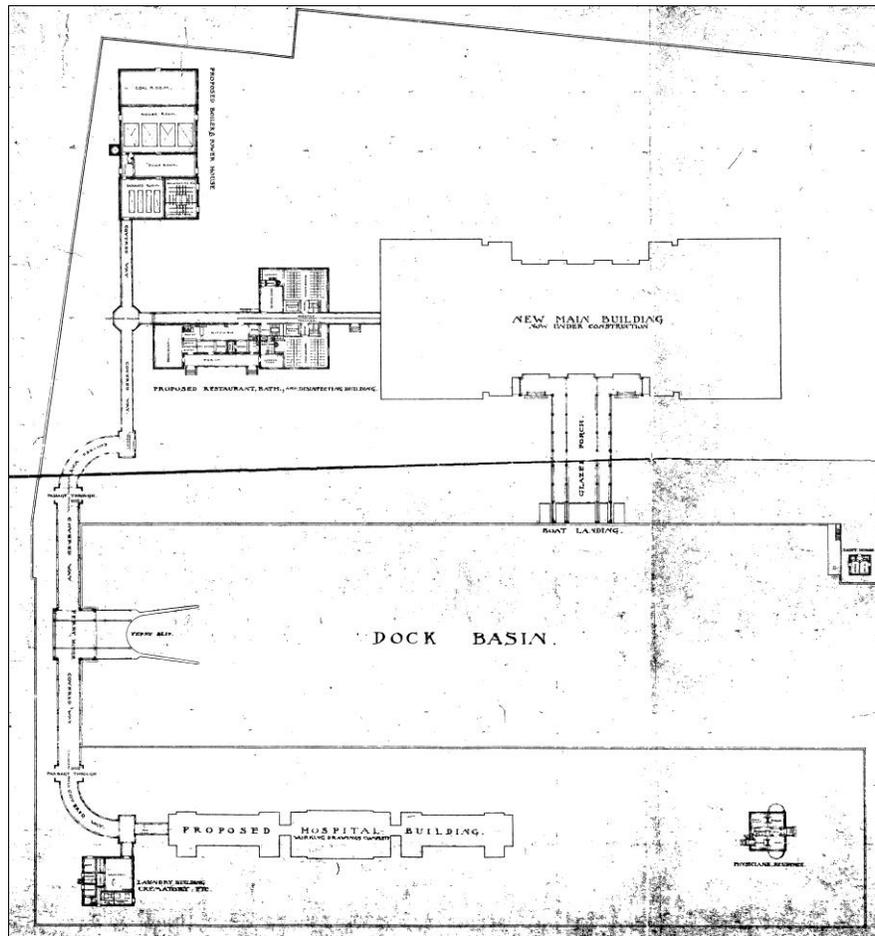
Original Site Plan with Proposed Hospital Building, Boring & Tilton, c. 1898.
